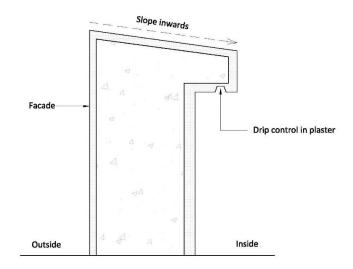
Drawing illustrating slope gradient on top surface of external wall.
